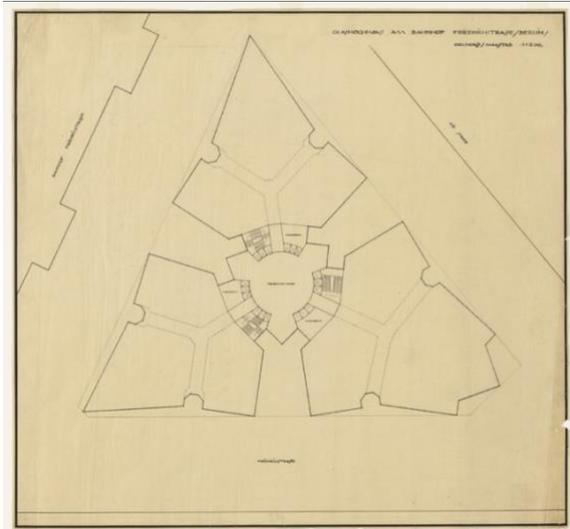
, Mies, Friedrichstrasse project, Typical floor plan, 1921⁶⁴
